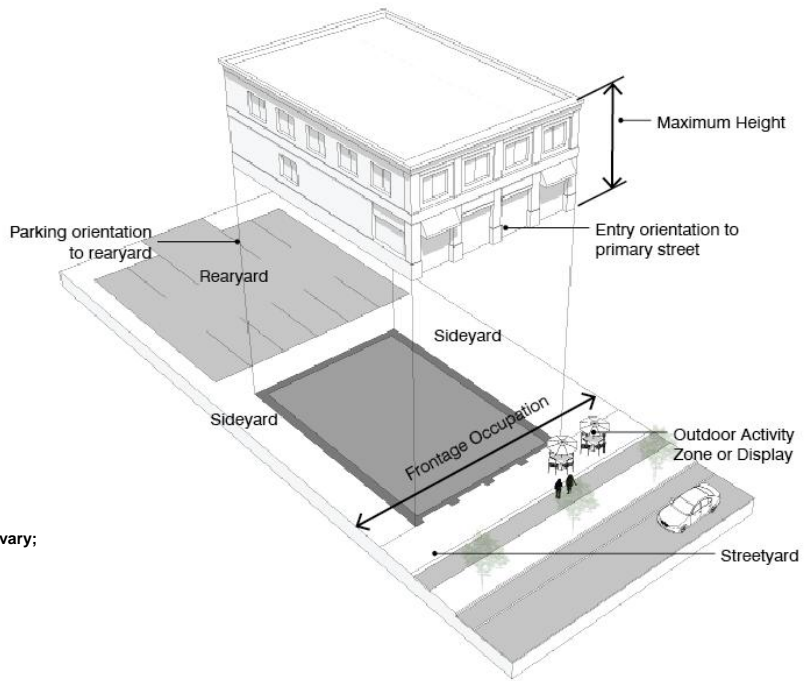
BUILDING AND SITE TYPES*Multi-Family Residential Building and Site TypeCharacter Examples:
